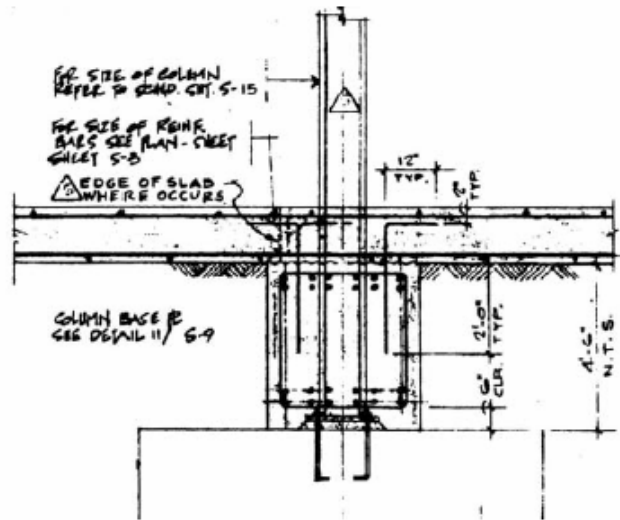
Typical Grade Beam Cross-Section at Base of MRF Columns
